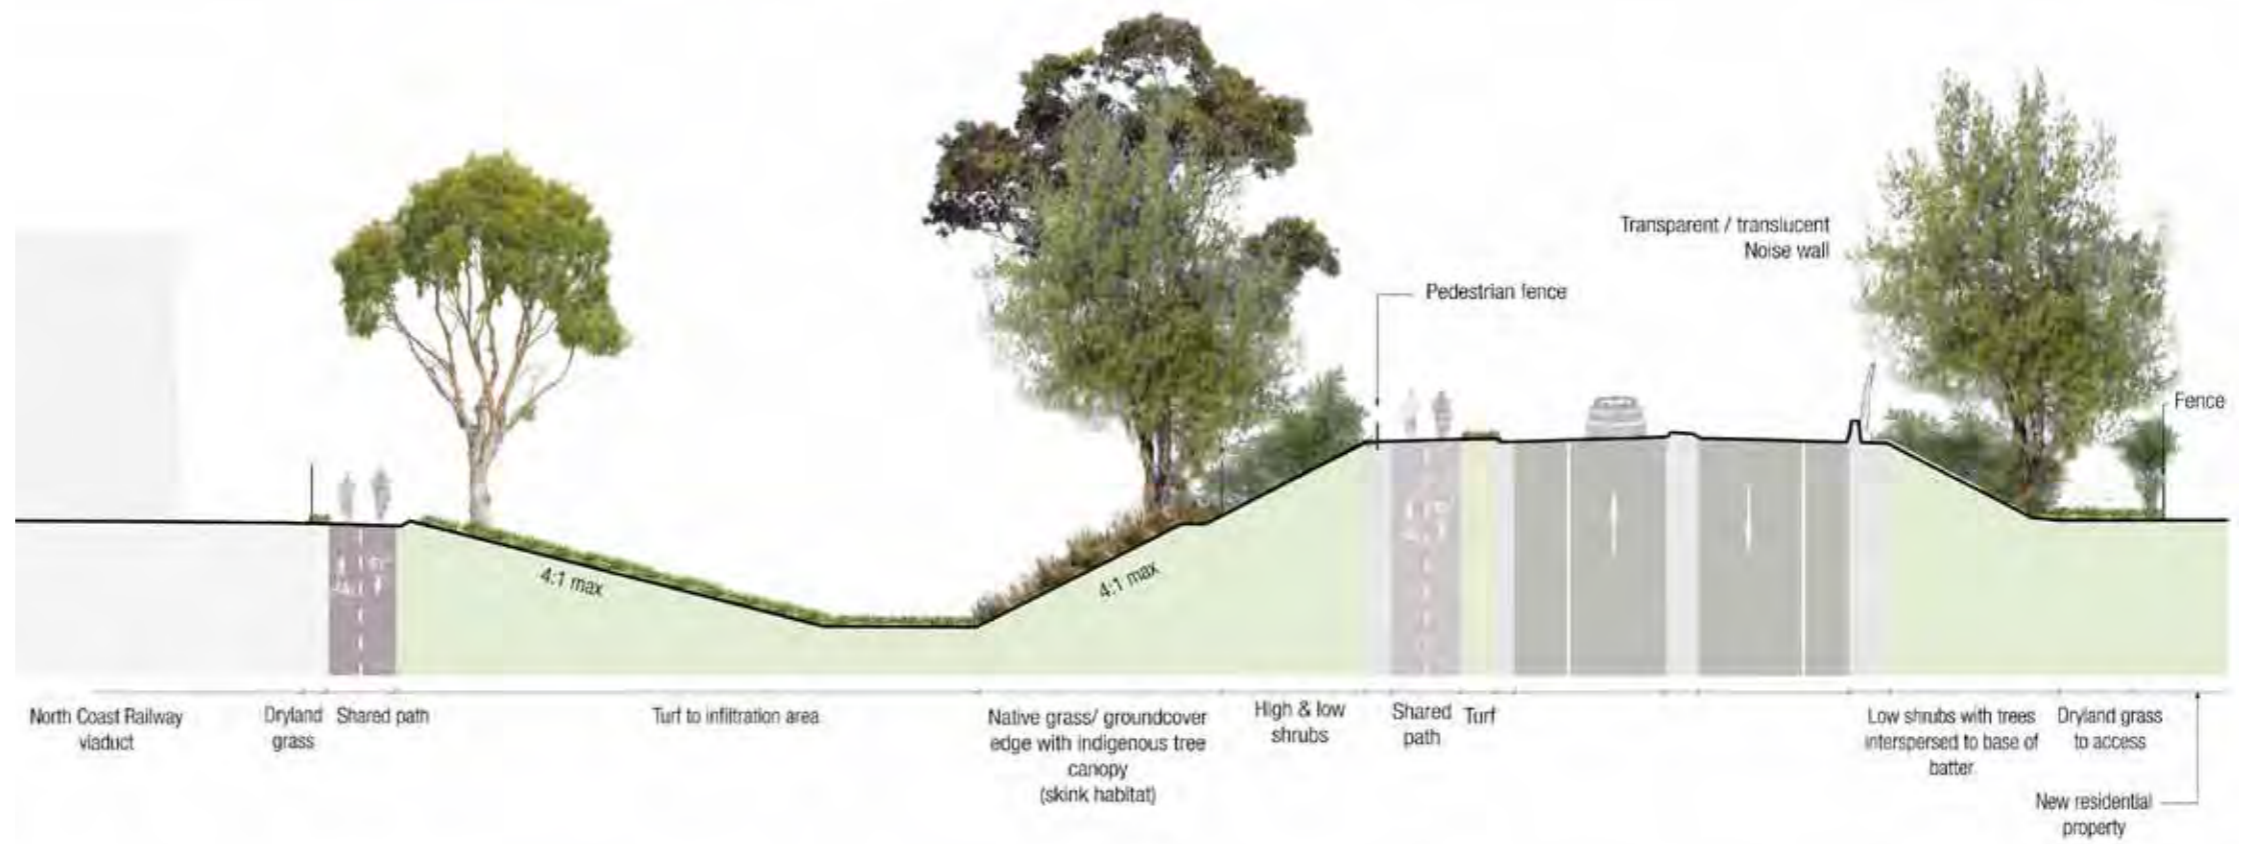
Cross section at Greaves Street Ch 1520 (Scale 1:250)
